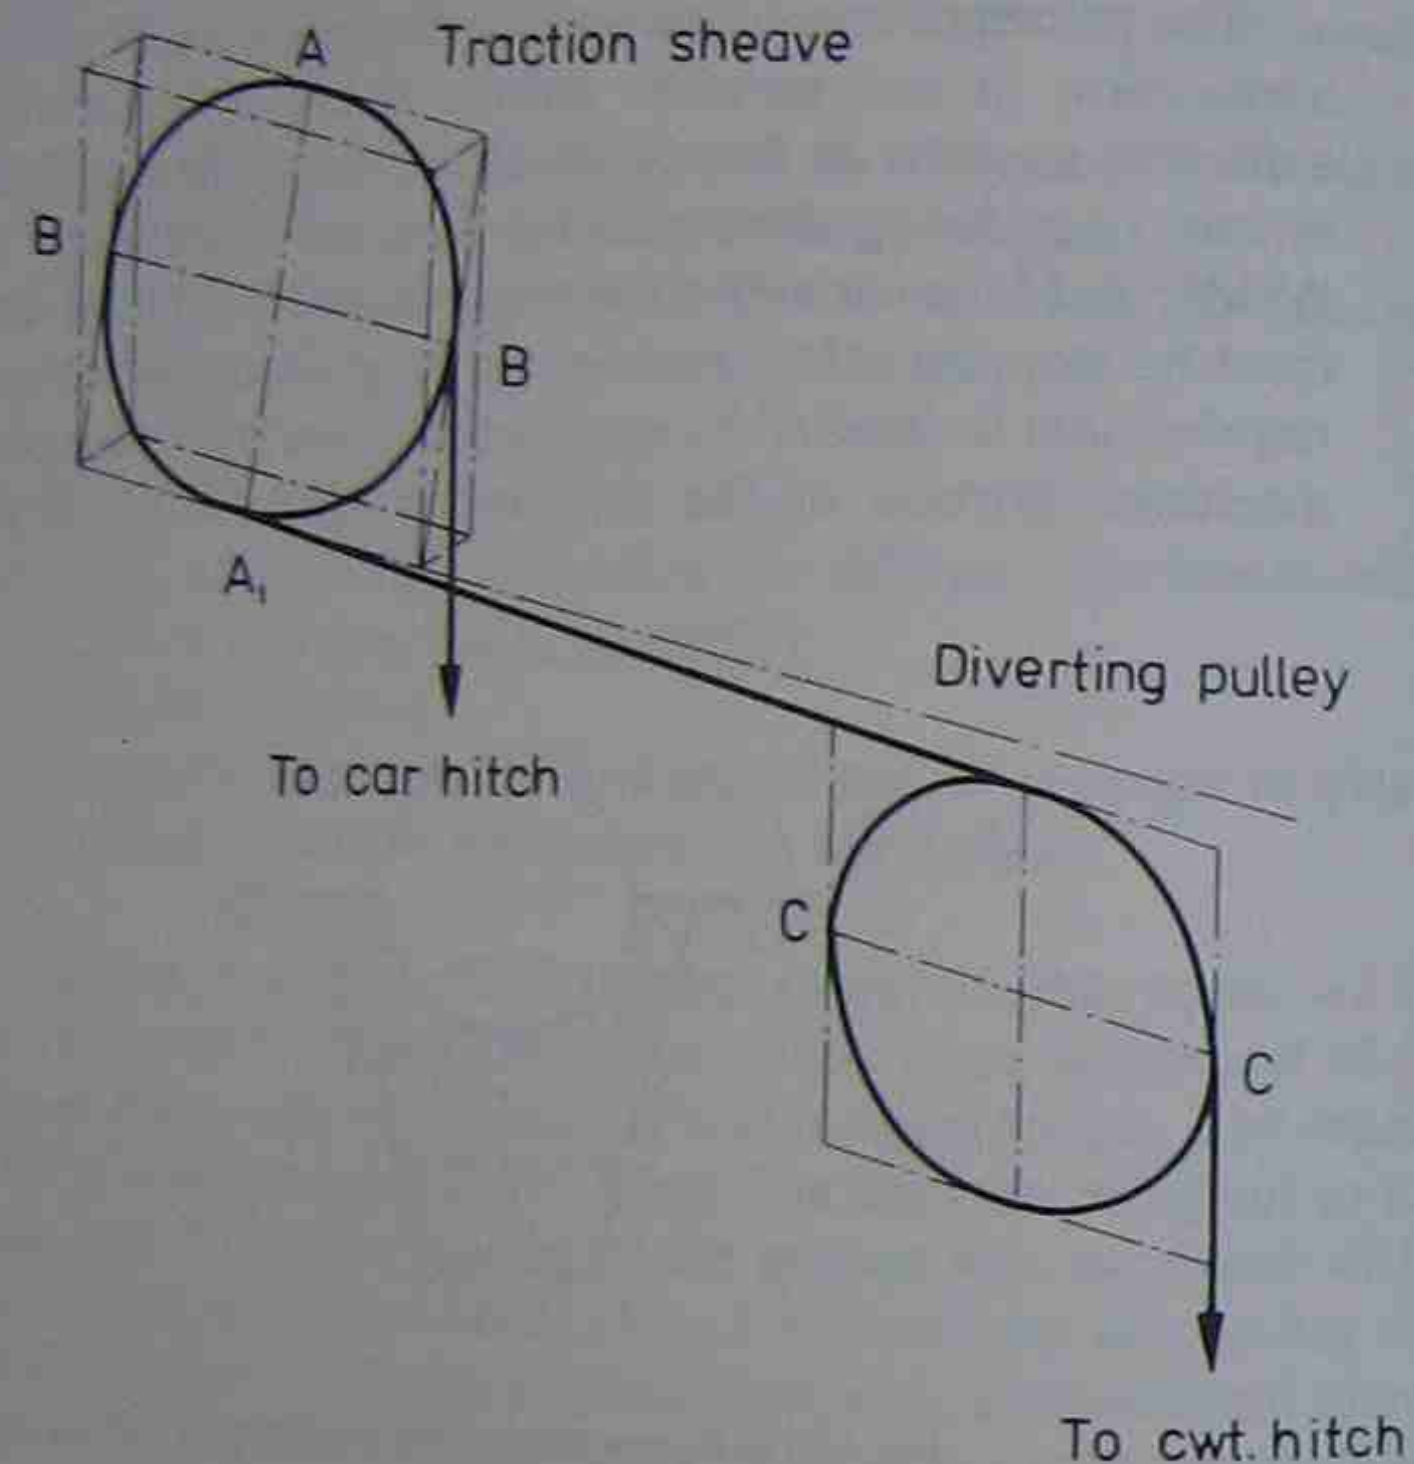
Diagram of the 'long wrap' arrangement of the machine.
